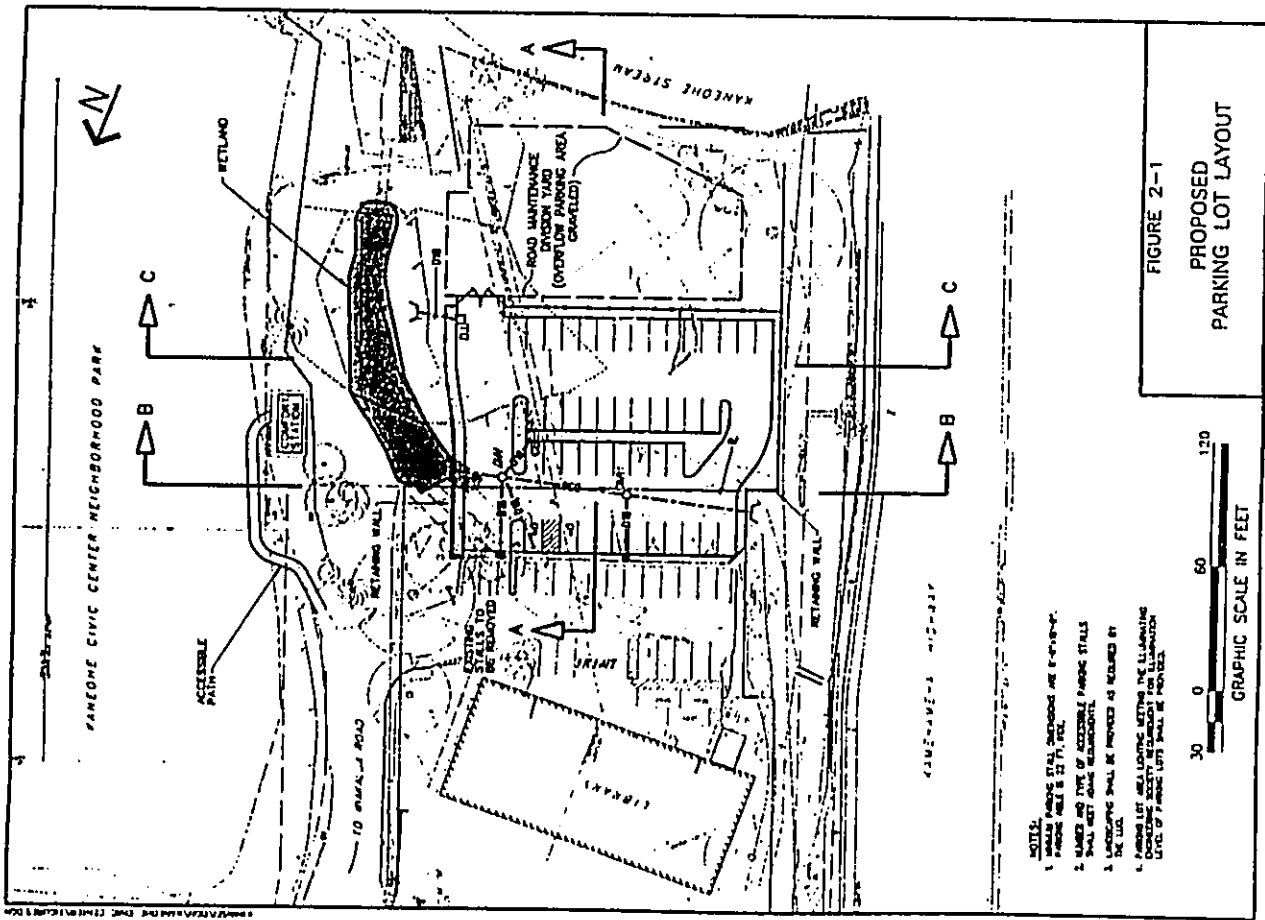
Proposed Parking Lot Layout (Provided by Engineering Concepts)
